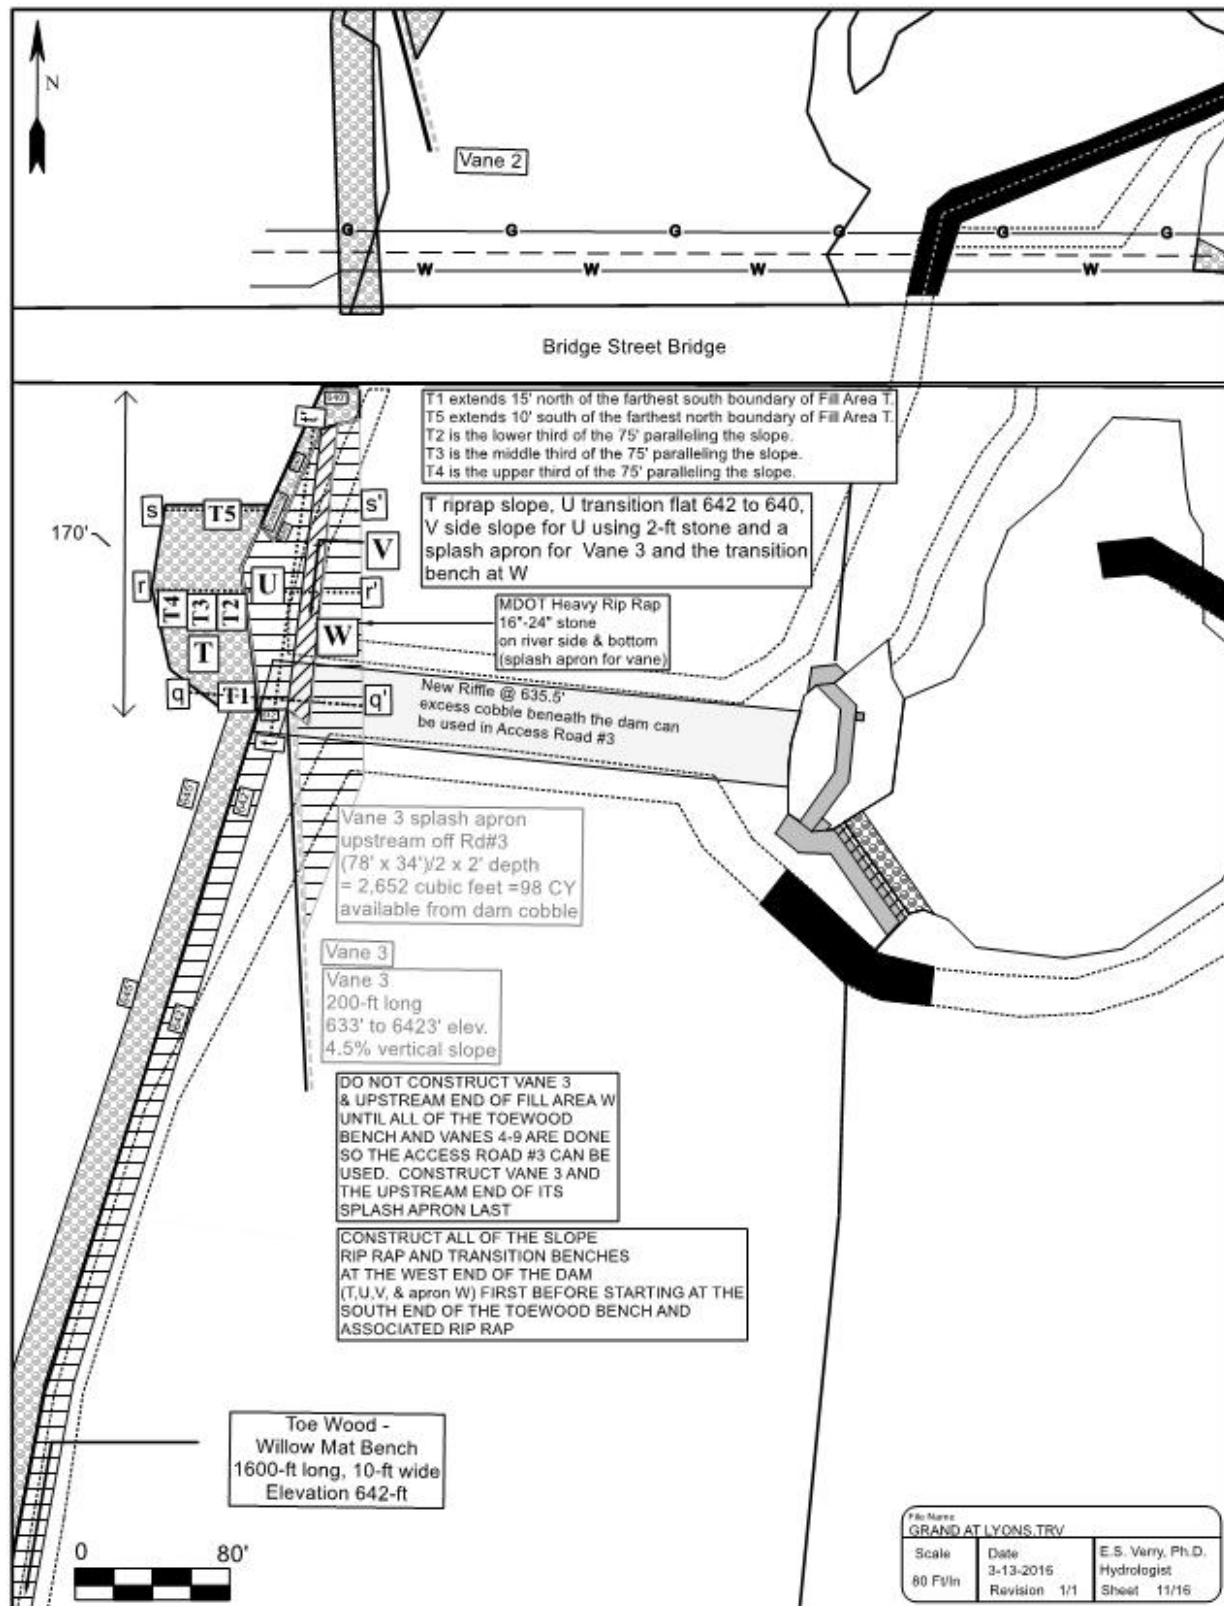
Plan view of bank rip rap and transition bankfull bench at west end of the previous dam.
